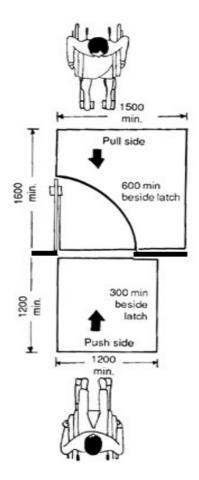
2: Approaching space at doors (source: Building and Construction Authority, 2002).
